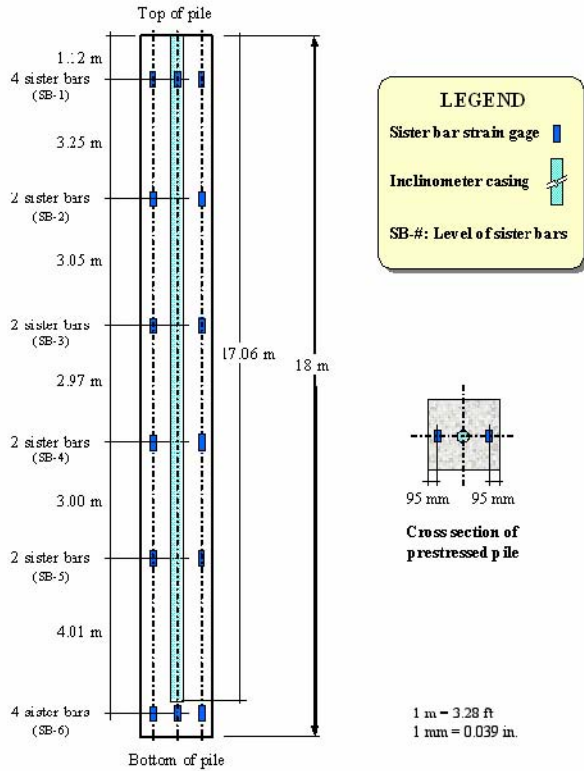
Instrumentation layout for prestressed concrete test pile (from Pando et al. (2006))
